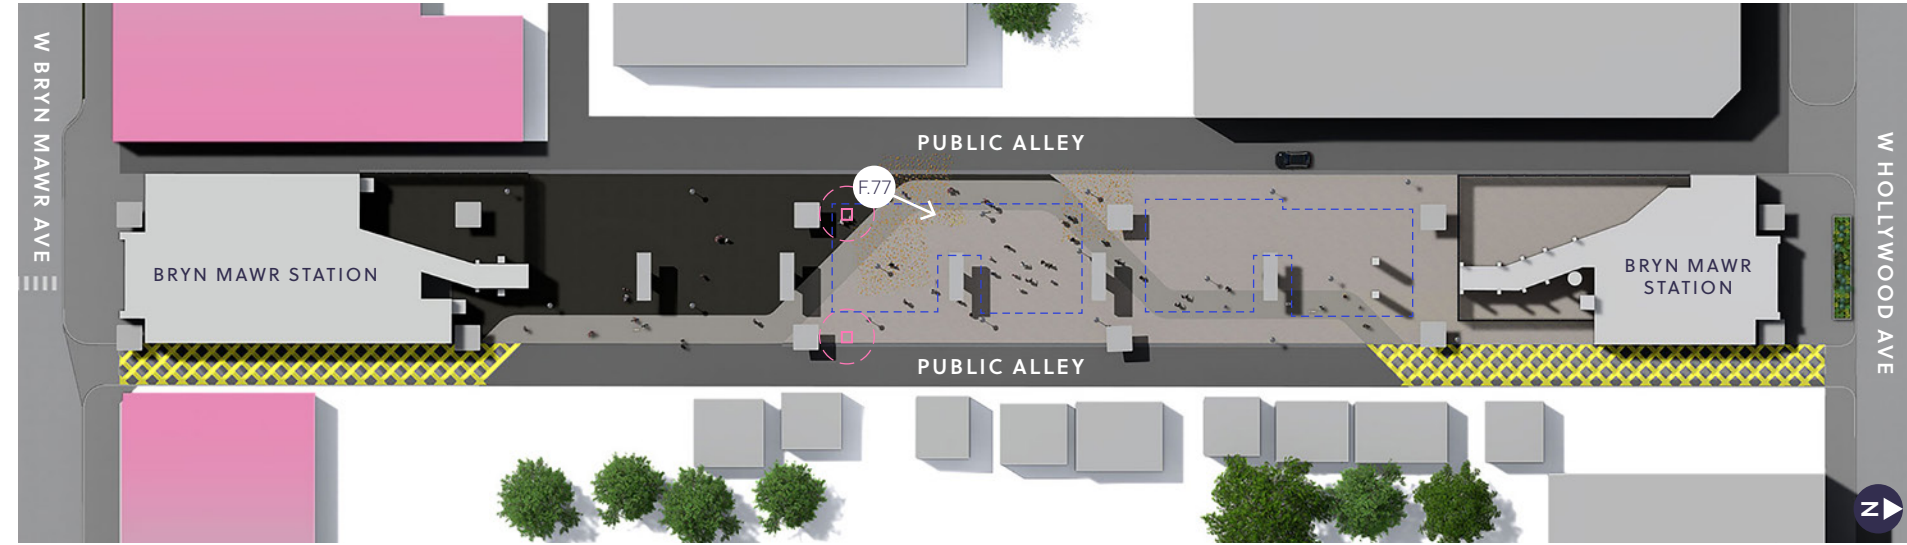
Final concept plan: Bryn Mawr to Hollywood
